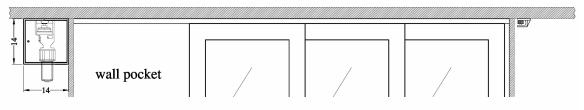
Motor Assembly and Access Panel Outside Door Pocket
